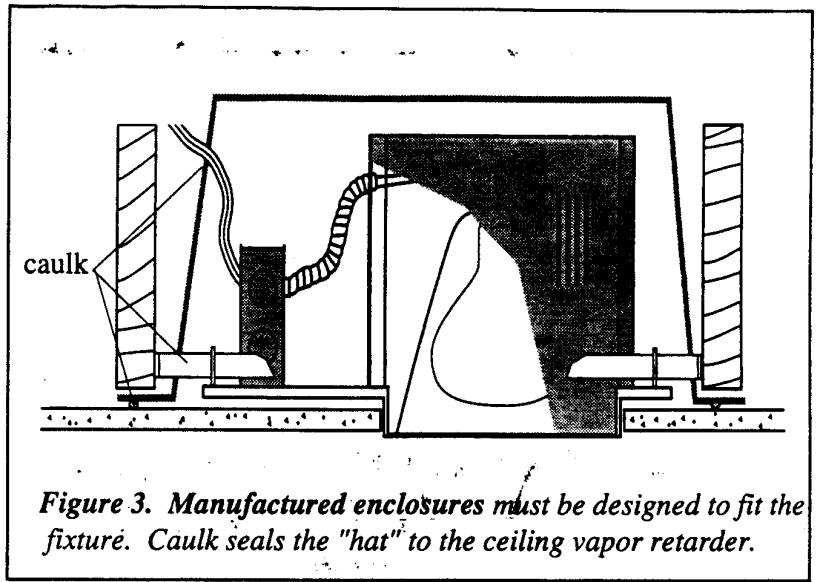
Manufactured enclosures must be designed to fit the fixture. Caulk seals the "hat" to the ceiling vapor retarder.
